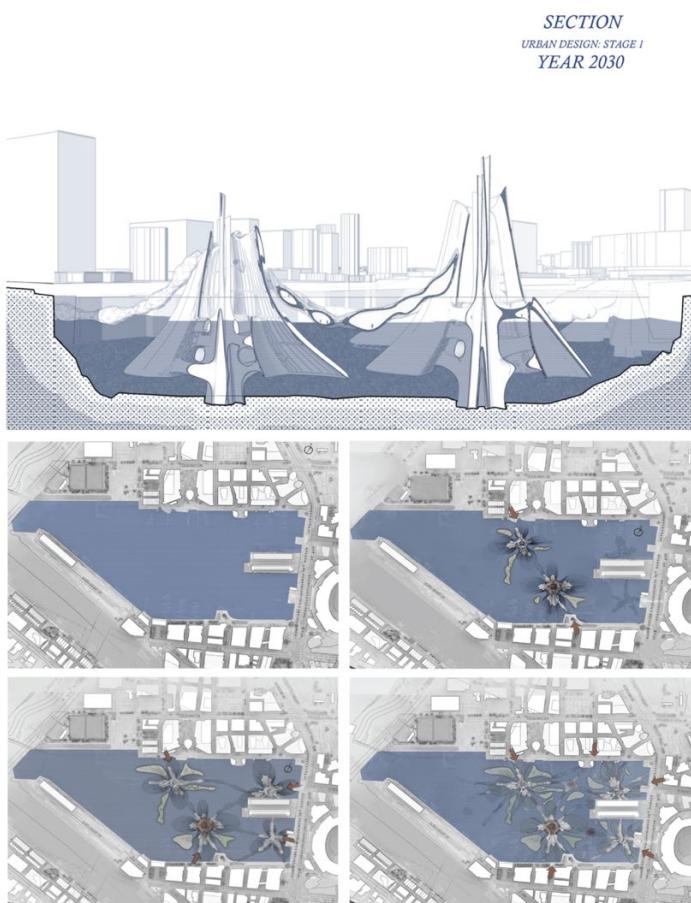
Section through termite-like structure (top) and development of the site plan from 2025 to 2080 (bottom) (Credit: Student team: Michelle Lee, Shilo Burgess and Jiang Zhiyuan – Instructor: Justyna Karakiewicz)
